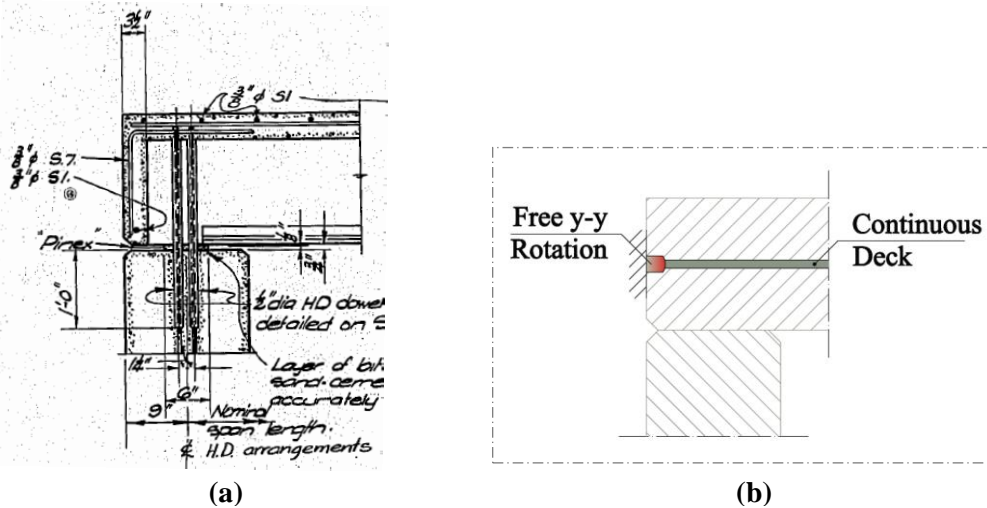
Detail of the connection between the deck and the abutment (a) in the drawings and (b) in the model.
